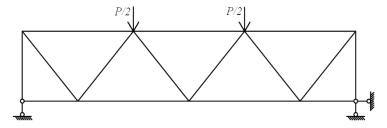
Structural design of welded truss and the scheme of its loading
